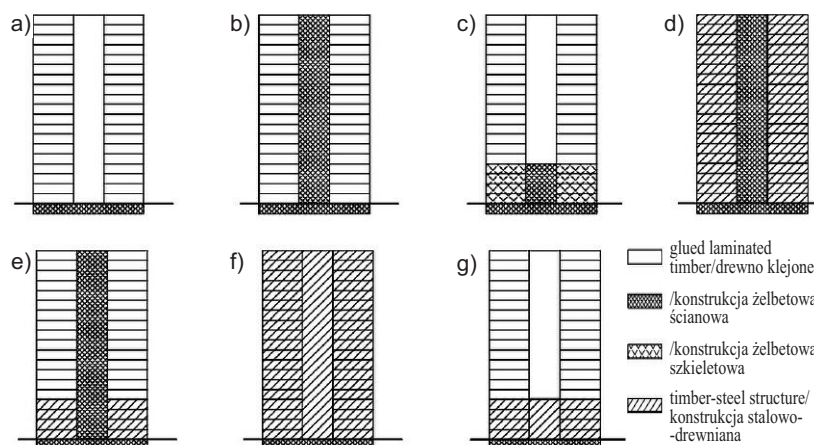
Structural systems of wooden buildings up to 100.0 m high: a) glued laminated timber structure; b) i c) timber-concrete structure; d) i e) timber-concrete-steel structure; f) i g) timber-steel structure
